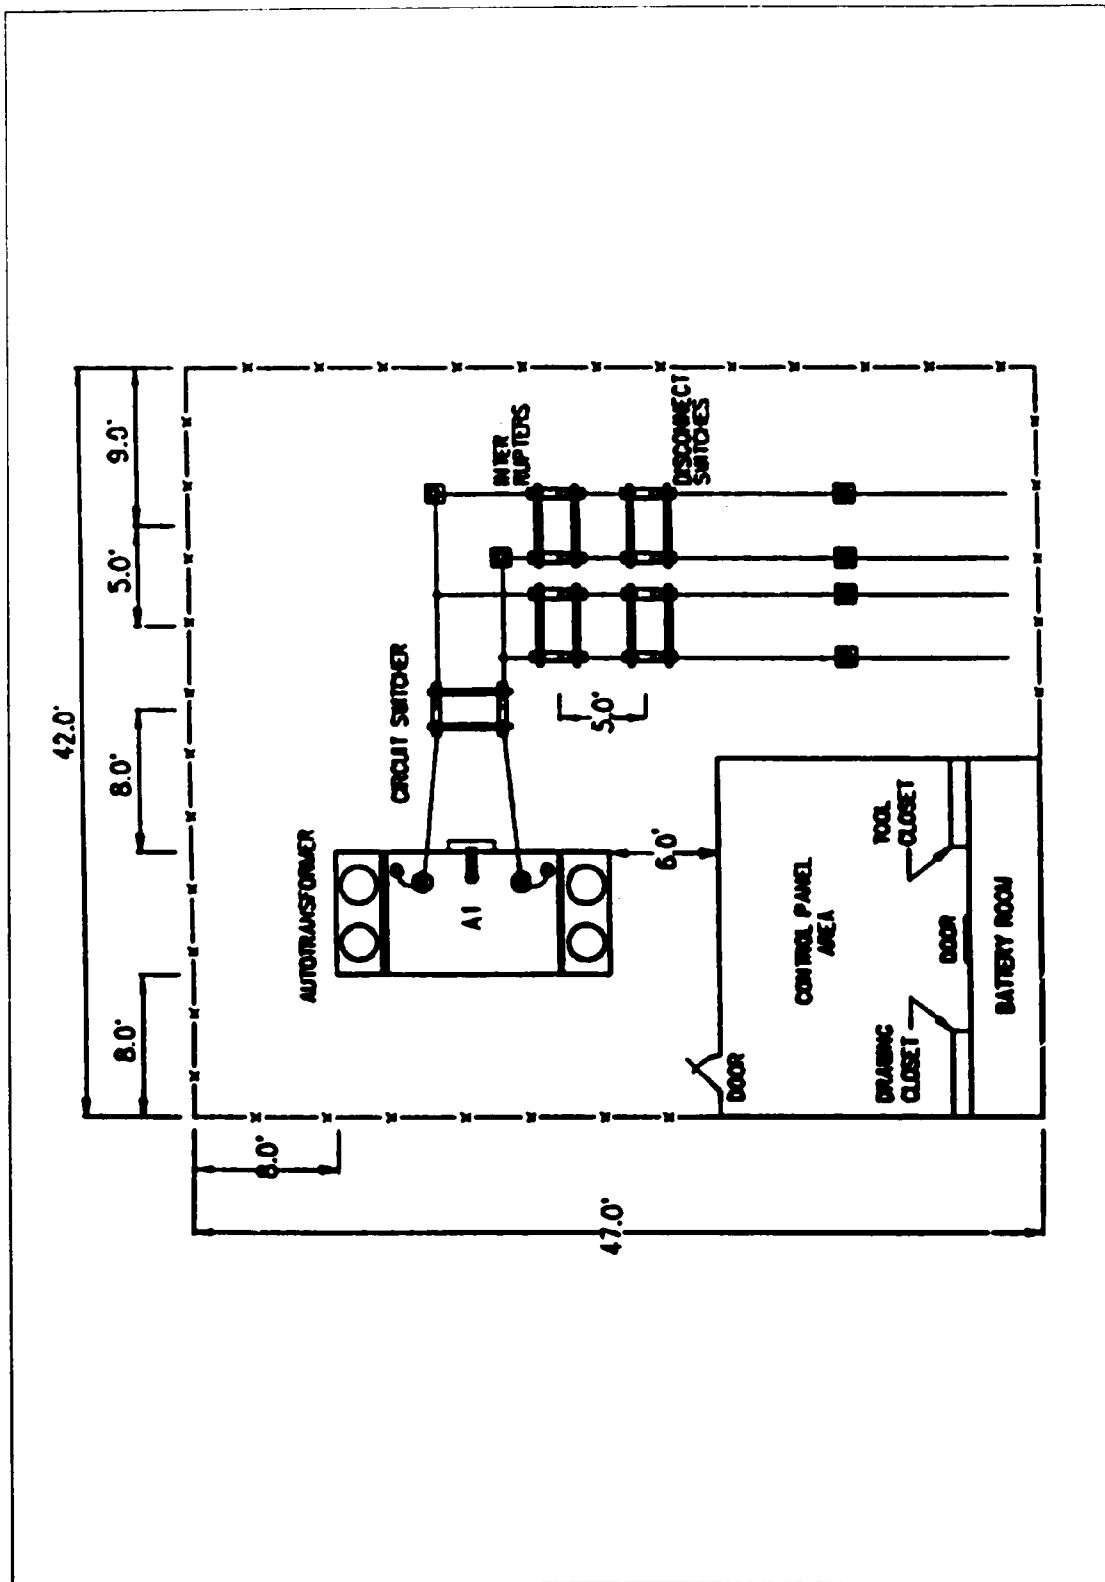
TYPICAL PARALLELING STATION PLAN
